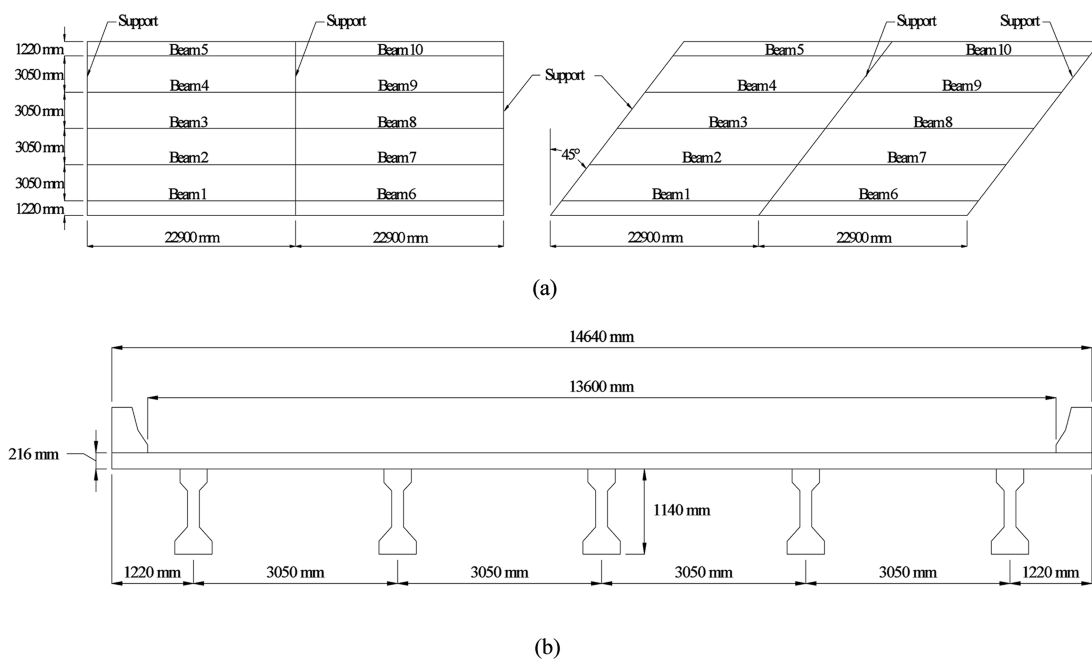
Two-span prestressed I-beam bridge: (a) plan view and (b) typical cross section
